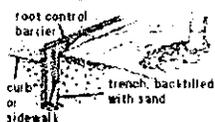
A vertical underground barrier will help keep tree roots from damaging concrete as they grow.
